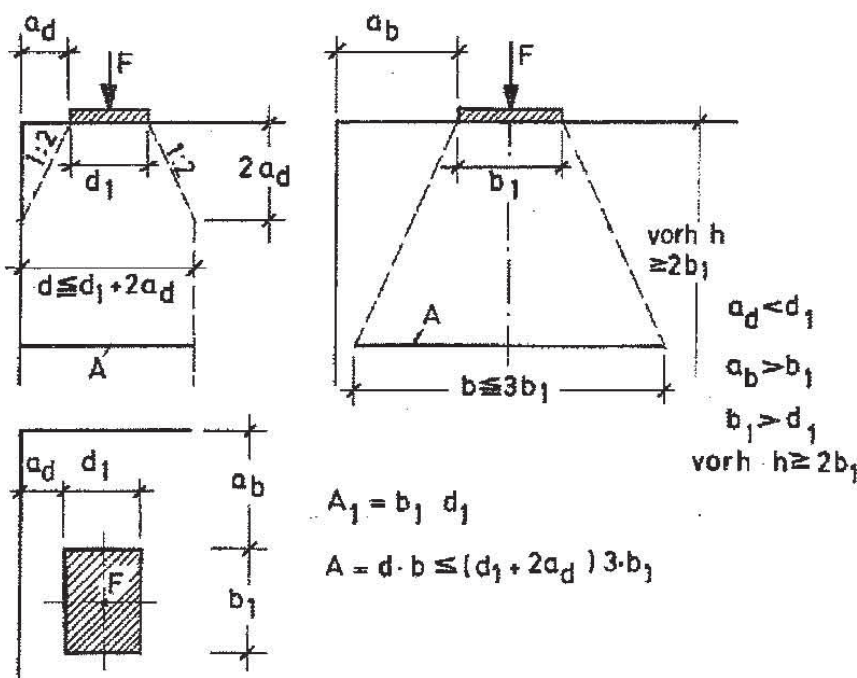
Determining the calculated distribution surface A_{c1} (=A) according to Leonhardt (Lecture on concrete and masonry construction – Part 2: Special cases for calculation of reinforced concrete constructions).
